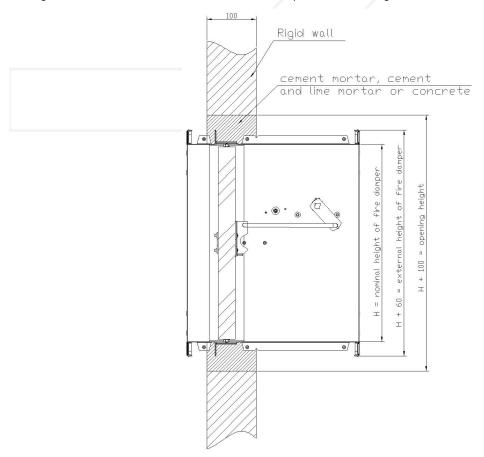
Installation method of fire dampers KWP-L in rigid wall
